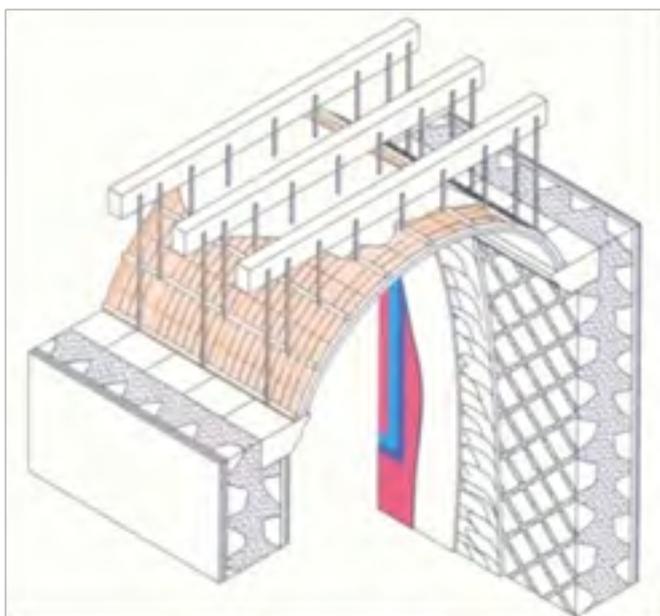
Roman masonry, light dome and stucco-work (Salavessa 2009).
